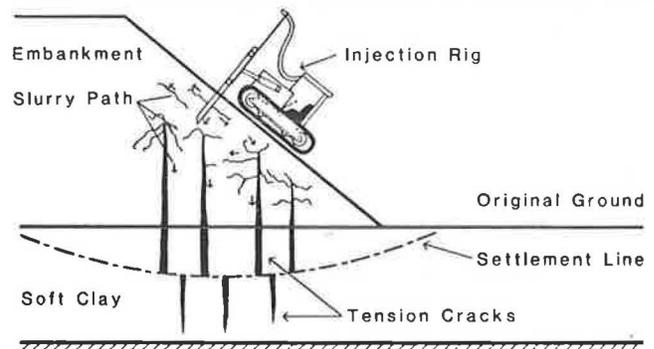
Tension cracks filling with lime/fly ash slurry.
